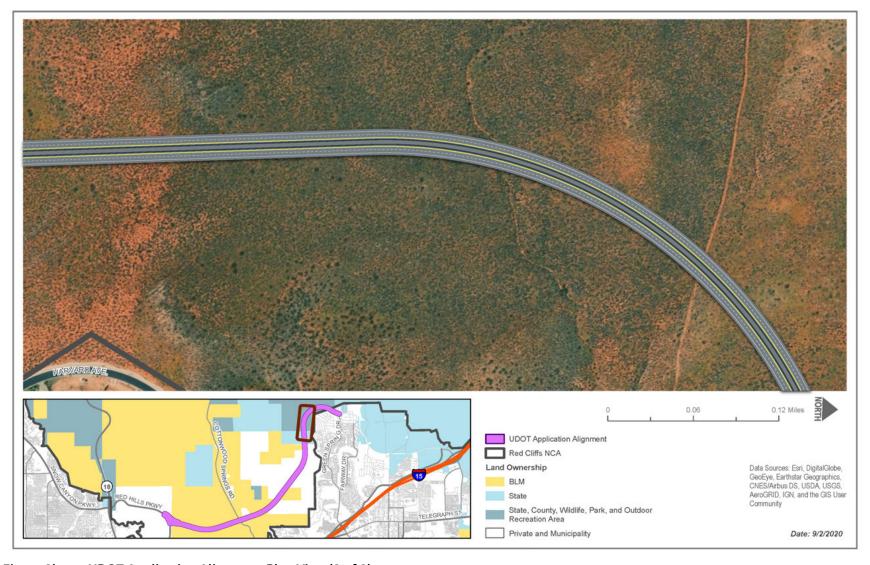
UDOT Application Alignment Plan View (8 of 9)
